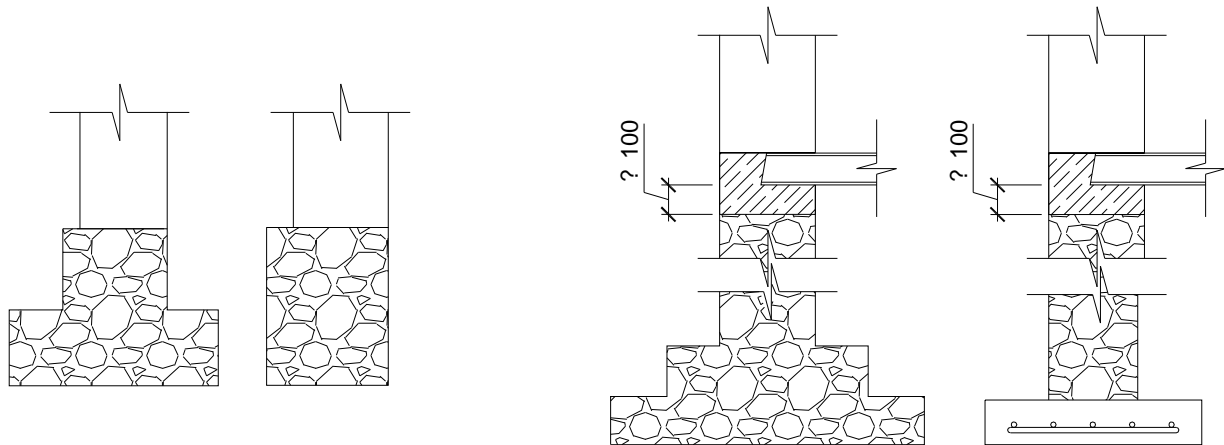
Raw stone and raw concrete foundations for buildings with low number stories.
